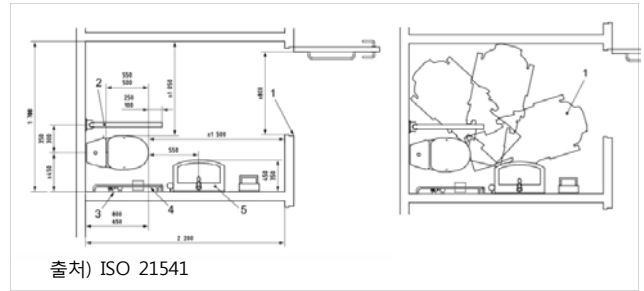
Wheelchair User Accessible Toilet Room, Type A
